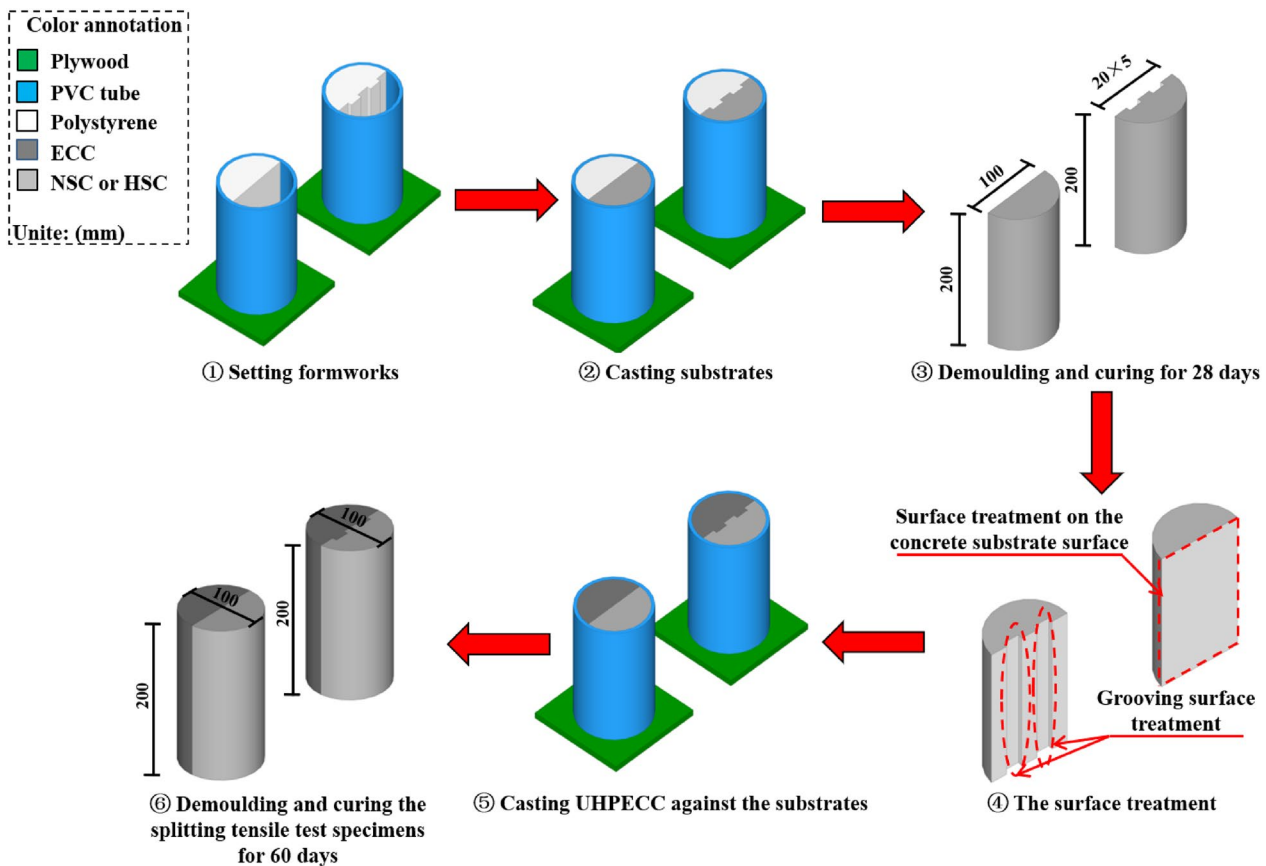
Fabrication progress and dimension of the splitting tensile test specimens
